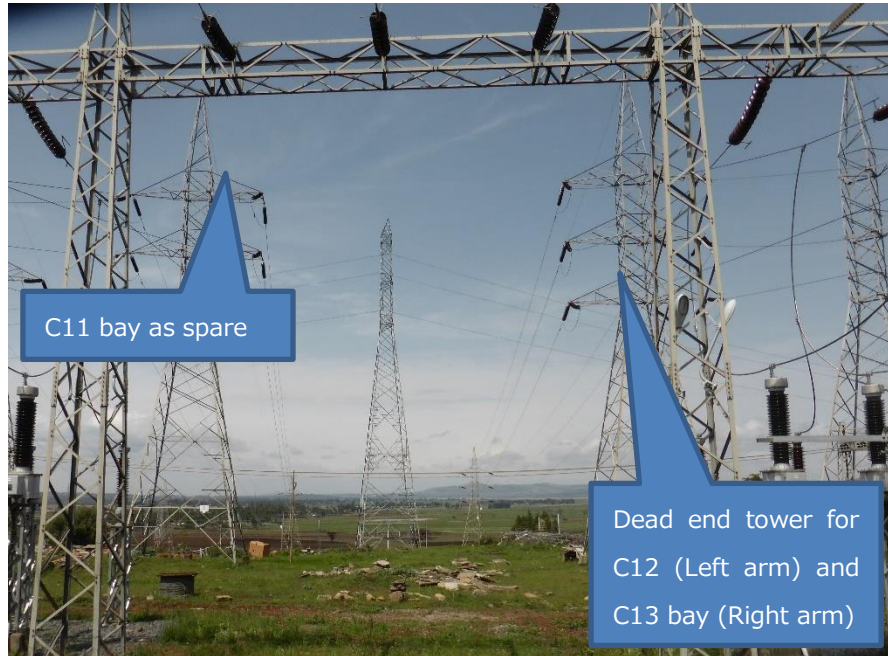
Existing bay connection in 132kV KALI S/S
